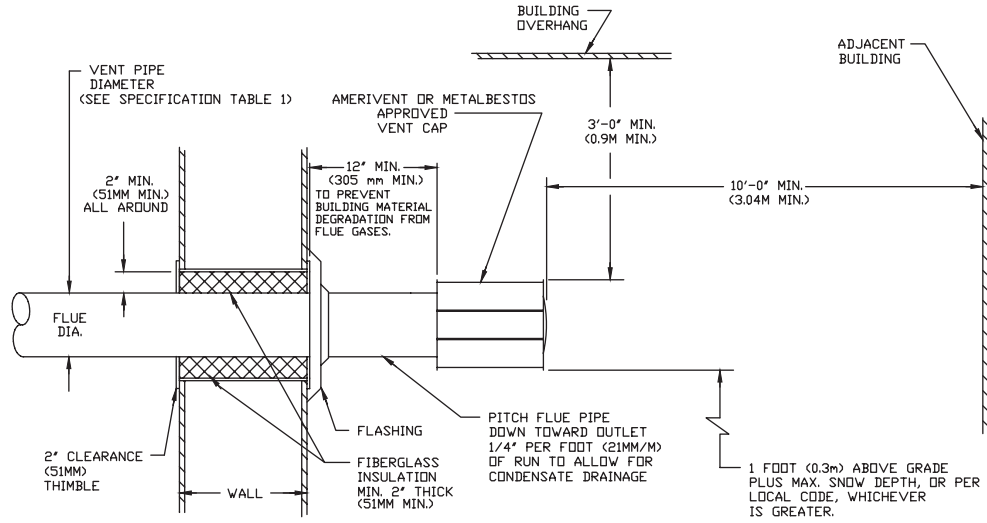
A – Horizontal Arrangement – Single Wall Vent System to Single Wall Termination
